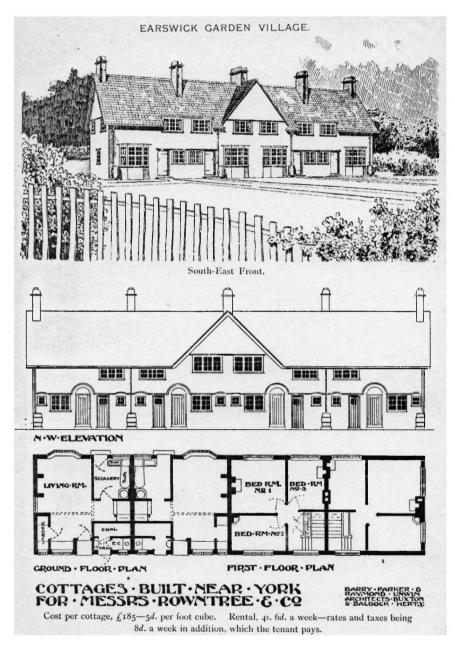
Type Cottages, Poplar Grove, New Earswick, Barry Parker and Raymond Unwin, 1904–5. The northwest street elevation brought the doors to the coal place and earth closet to public visibility and (together with the stairs opening out of the living room) was disliked by many tenants. (Author's collection.)
